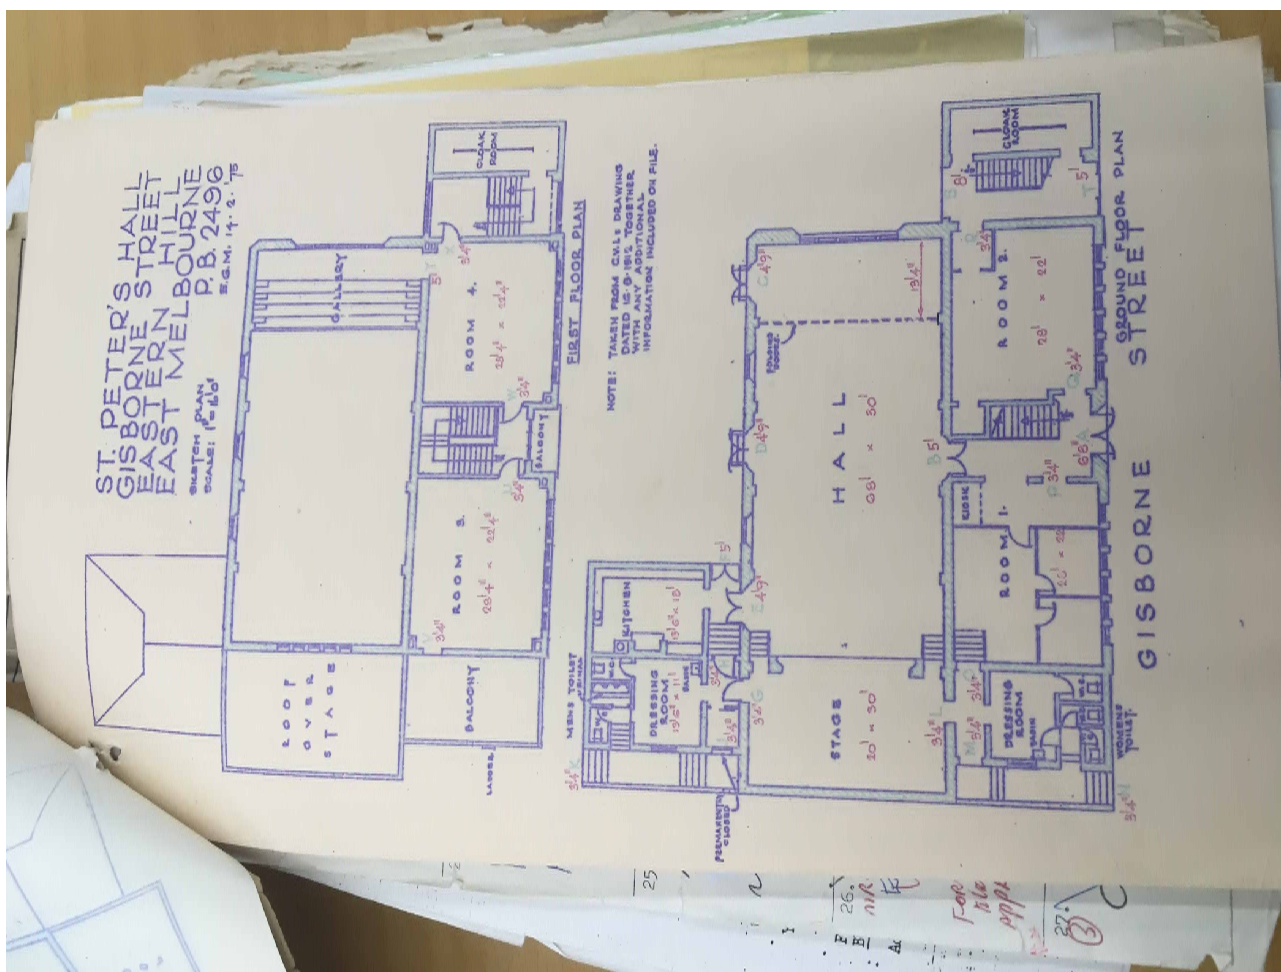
Floor plans from the Health Department dated 1975 show the internal layout modified
